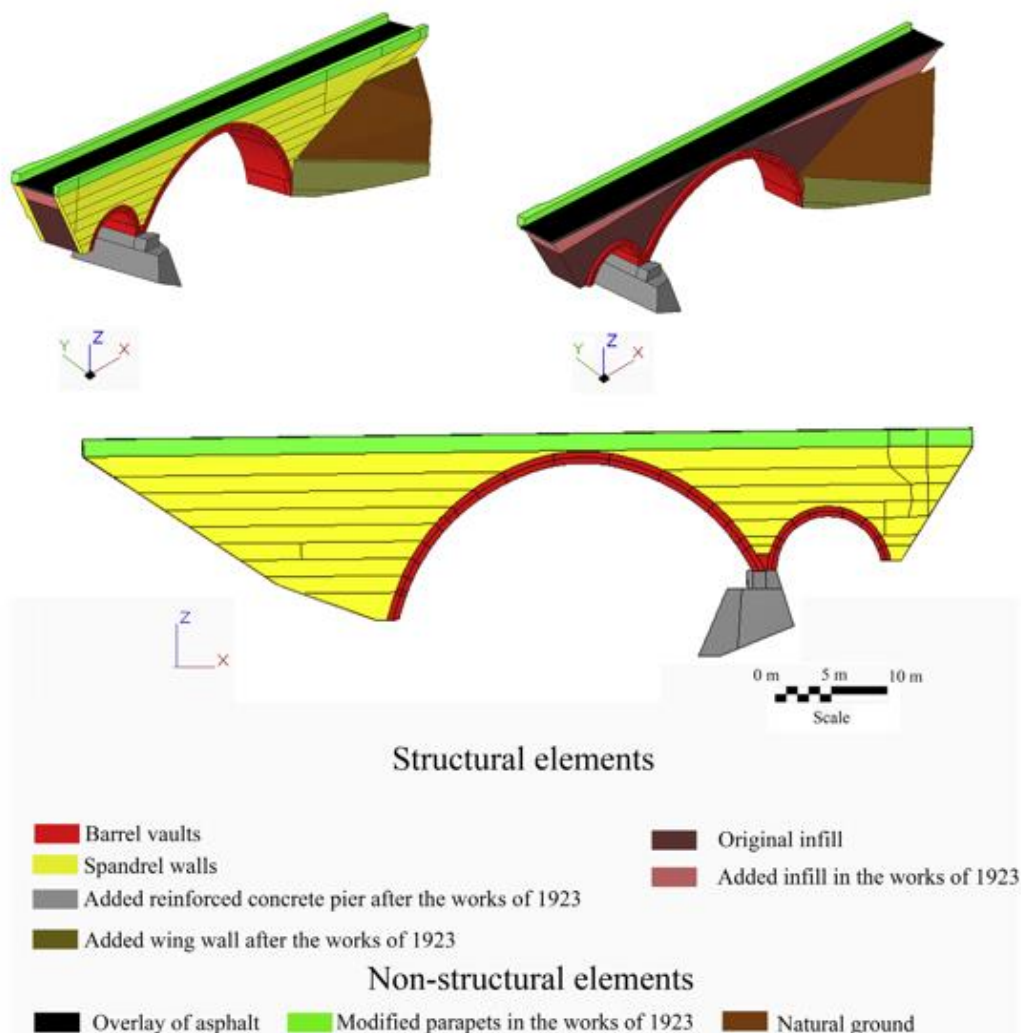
Structural elements and non-structural elements of the Arco Bridge.
